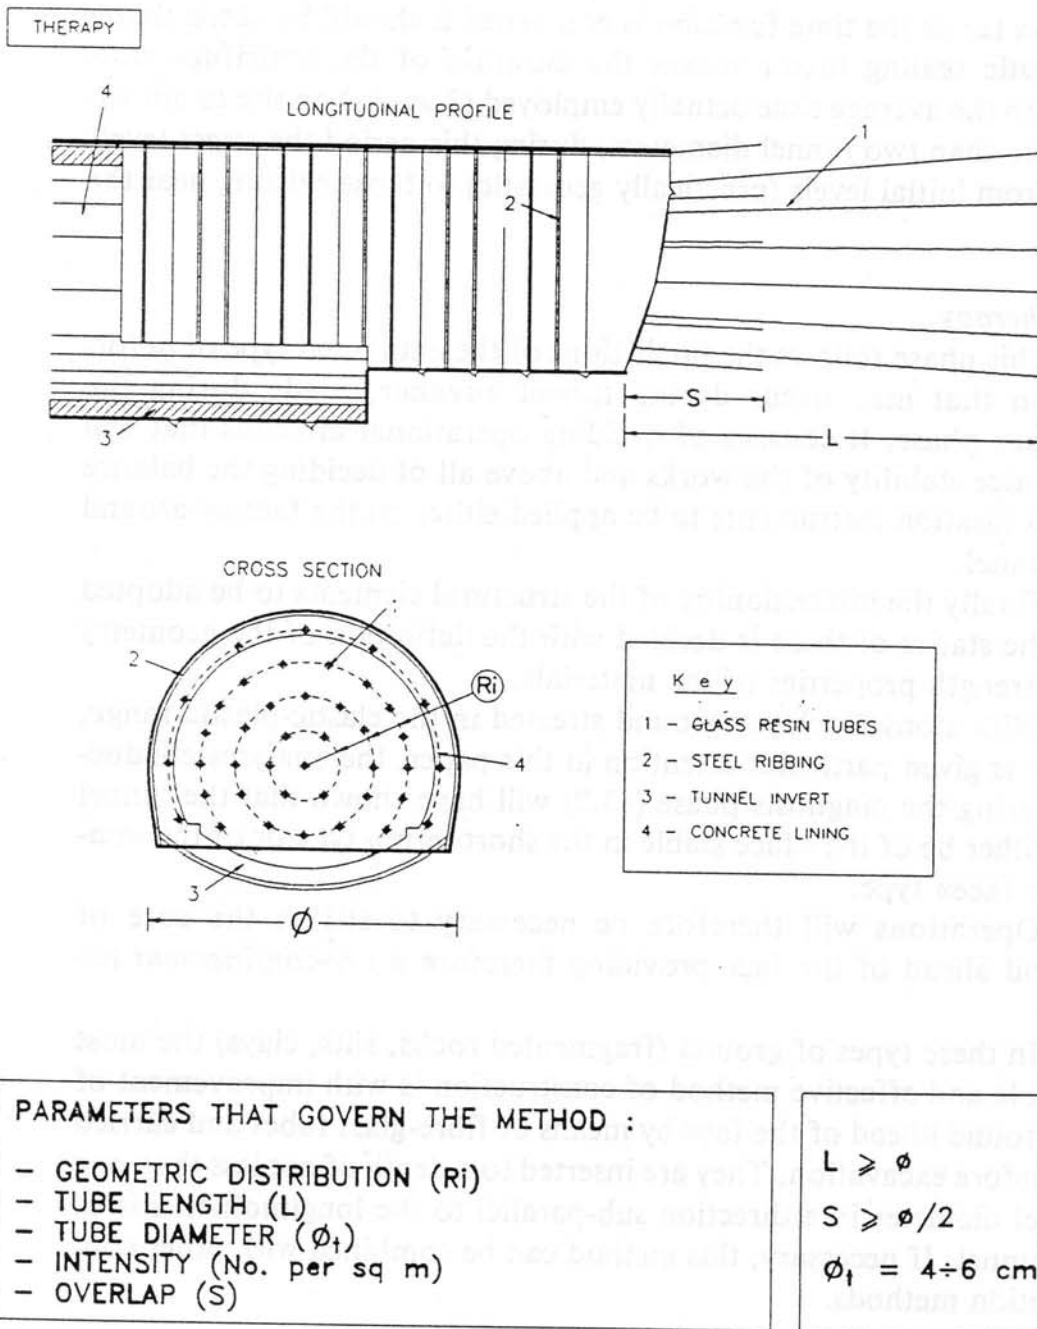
Advance ground improvement of the face with fibre-glass tubes: typical scheme
